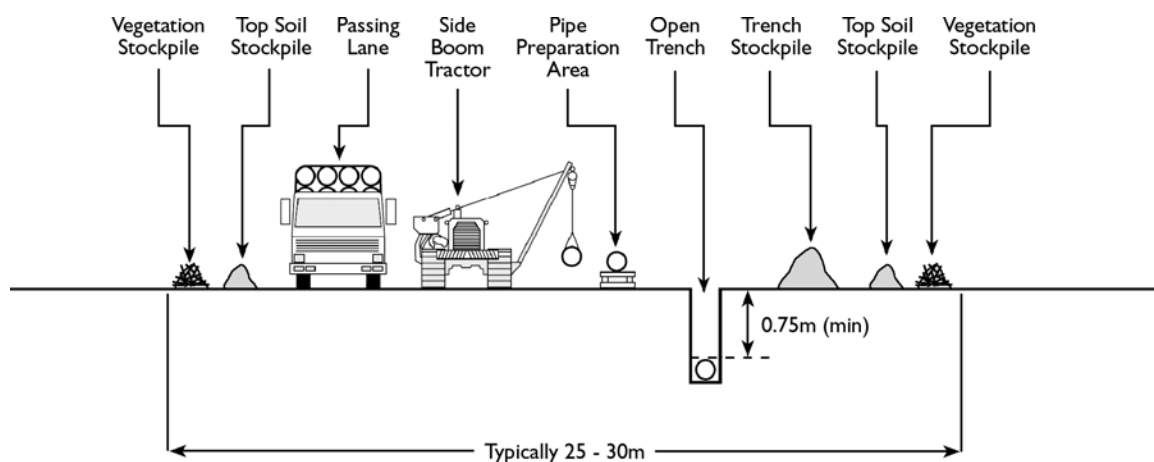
Typical Right-of-Way Layout for Cross-Country Pipeline Construction
